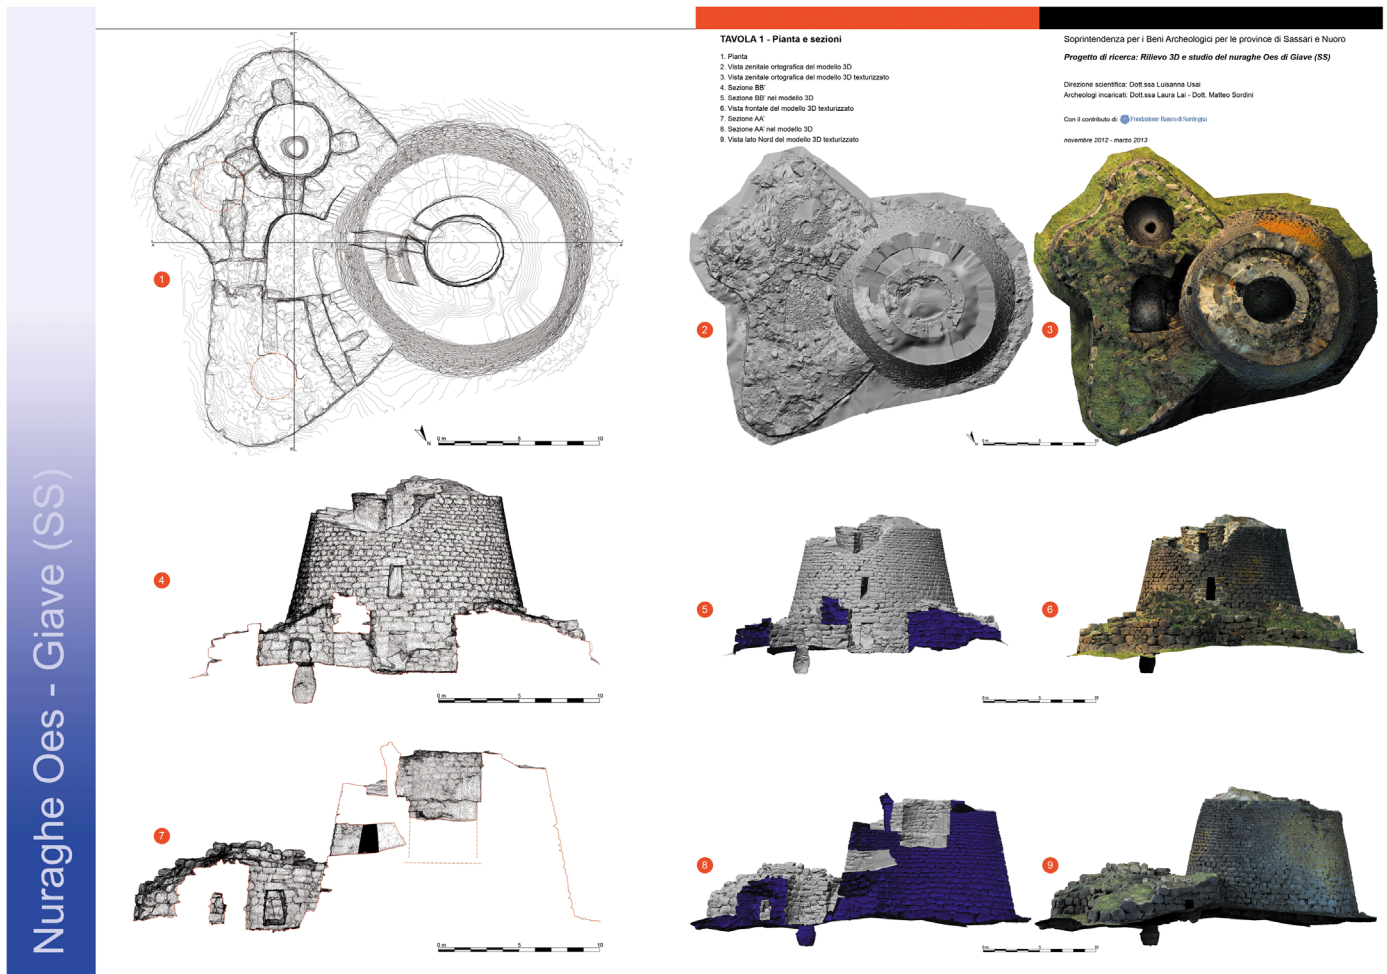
Technical drawing in A1 format with plan and sections views in wireframe, non-textured, and textured mode.
